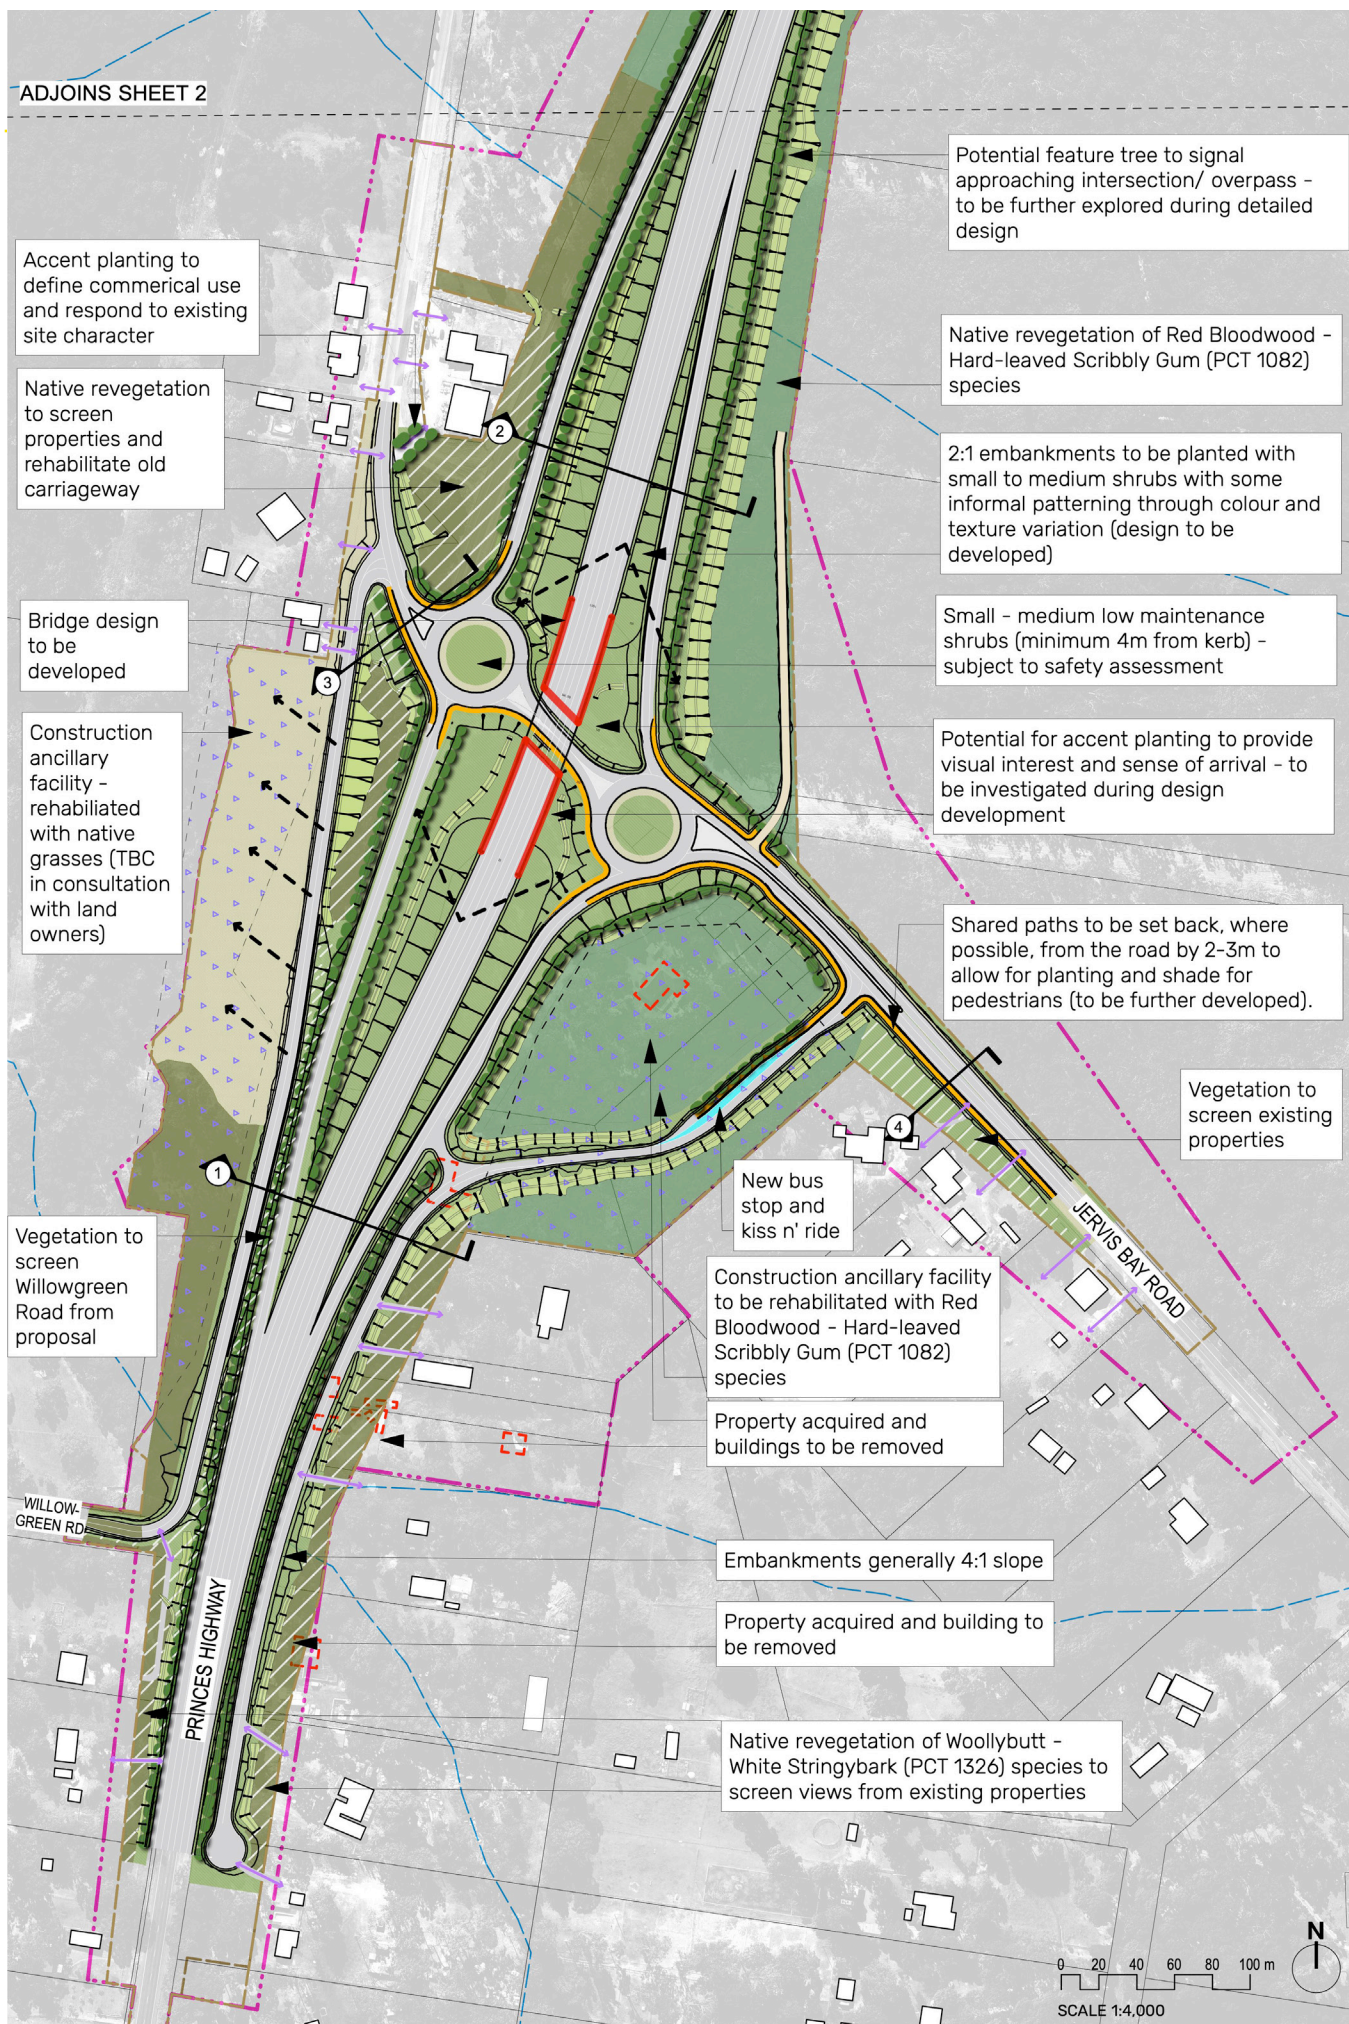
Urban Design and Landscape Strategy (Sheet 1). Diagram based on concept design only and will be refined during detailed design.
